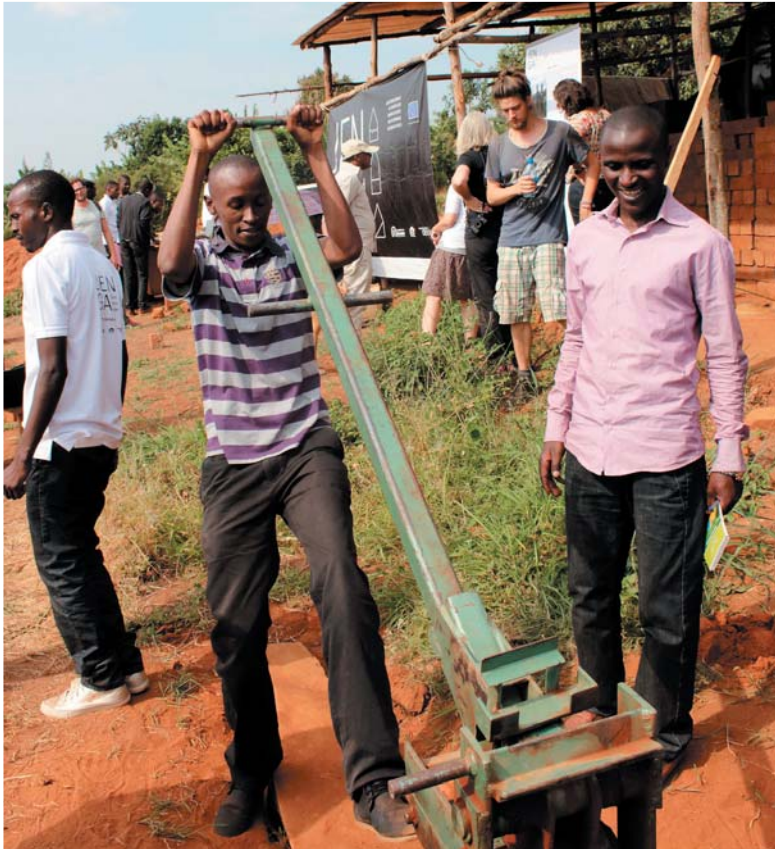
Stabilised brick making at the UR design-build construction site in Rwinkwavu
